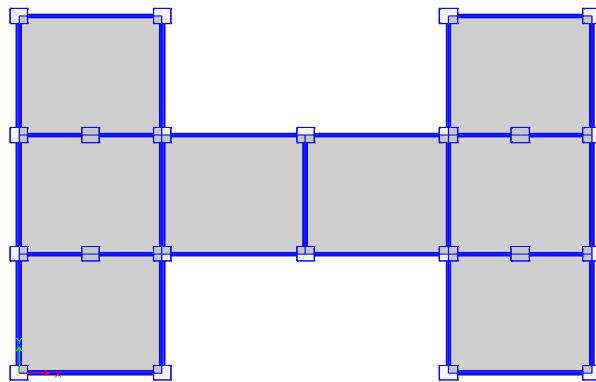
2D View of 8 stories I-shape Building in CFT Column
